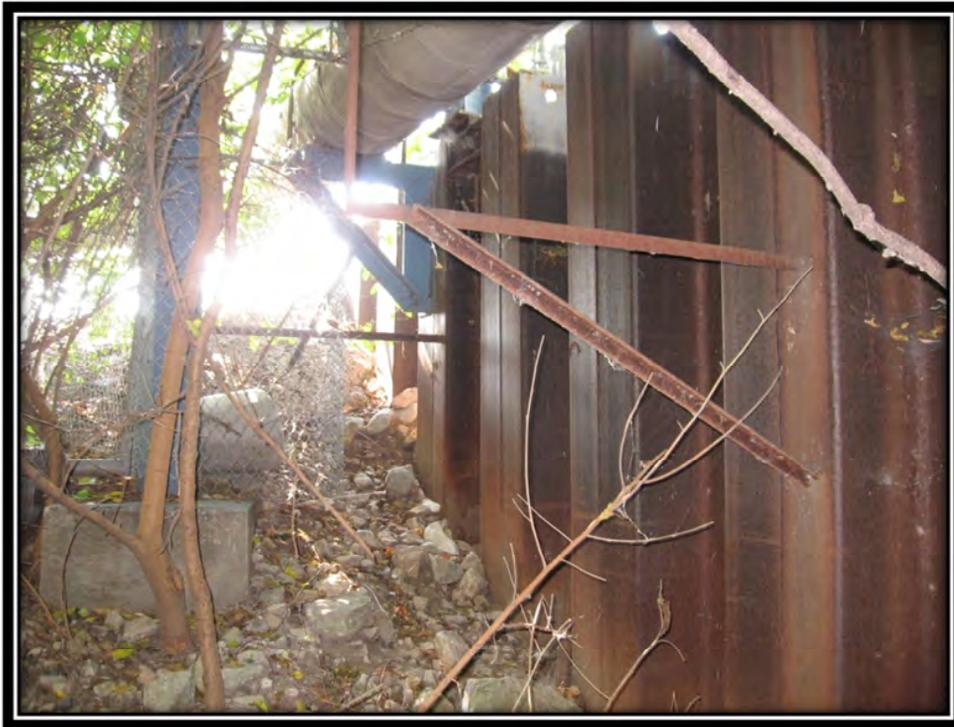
North Side of the Oil Delivery Sheet Pile Platform (Note Penetration into Embankment)
